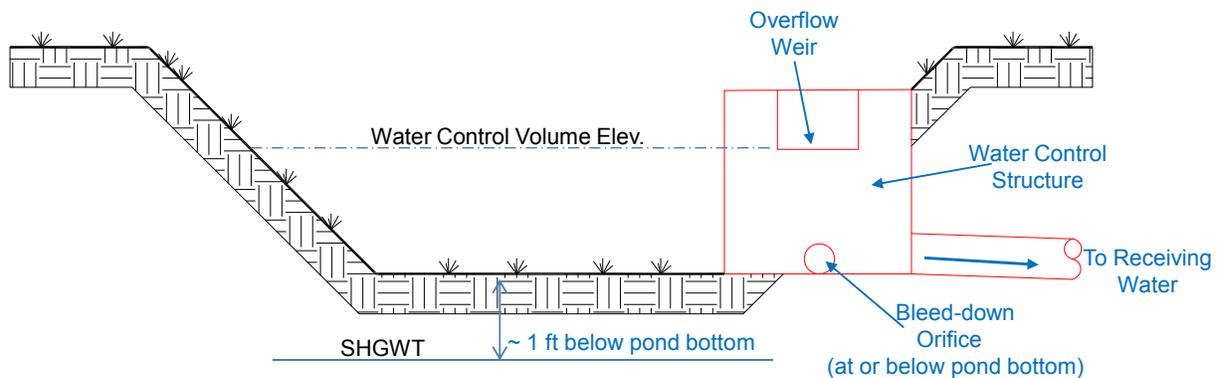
Schematic of a Typical Dry Detention Pond System.
